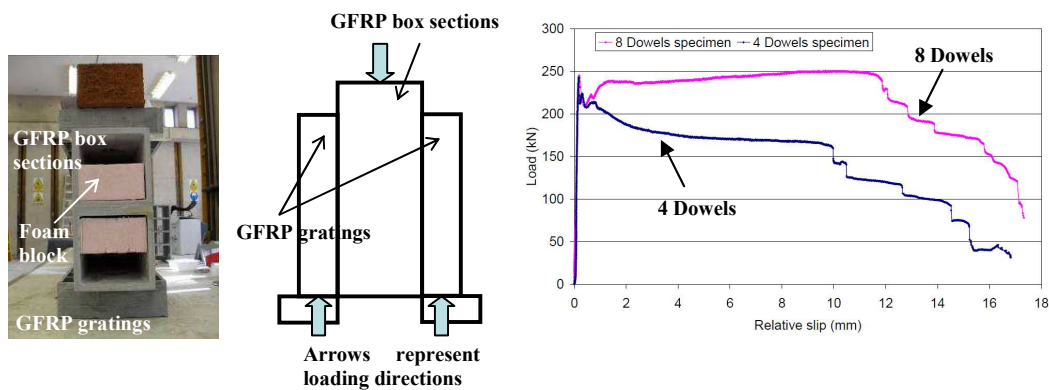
Push-out test specimens, tests setup and load-slip plot of shear connectors
